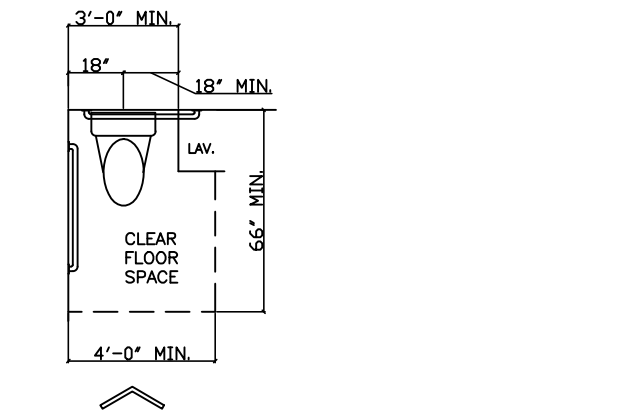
CLEAR FLOOR SPACE AT WATER CLOSETS
